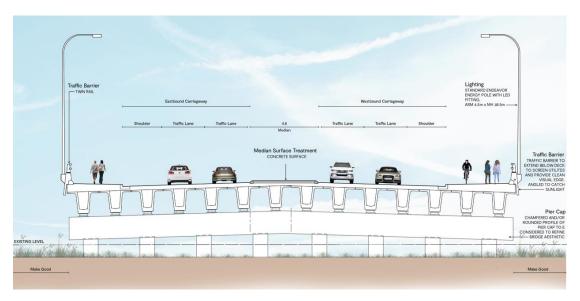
Typical section through bridge over Eastern Creek viaduct at CH 2280
